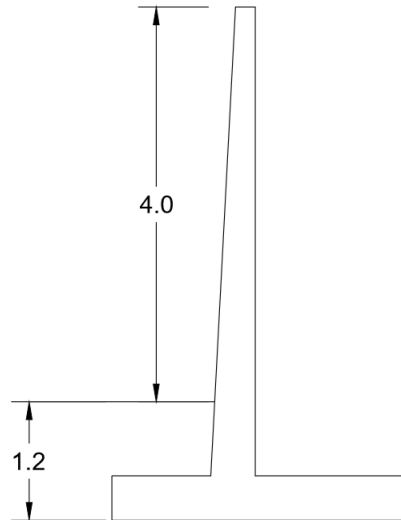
Cantilever retaining wall (Depth of foundation)
